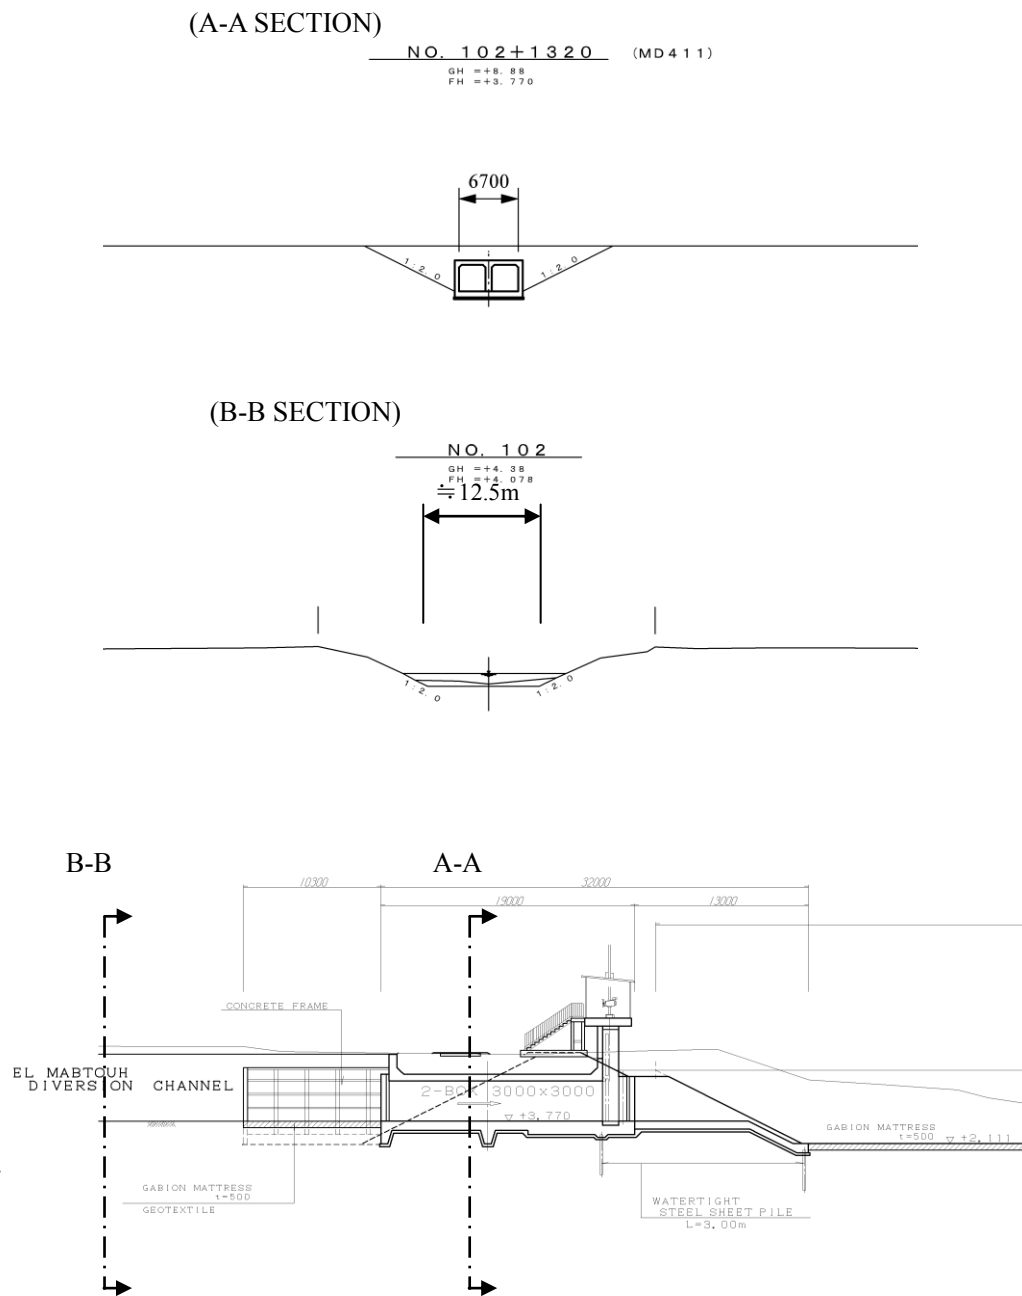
Typical Structural Drawing of Channel Near Confluence and New Drainage Gate Cross Section
